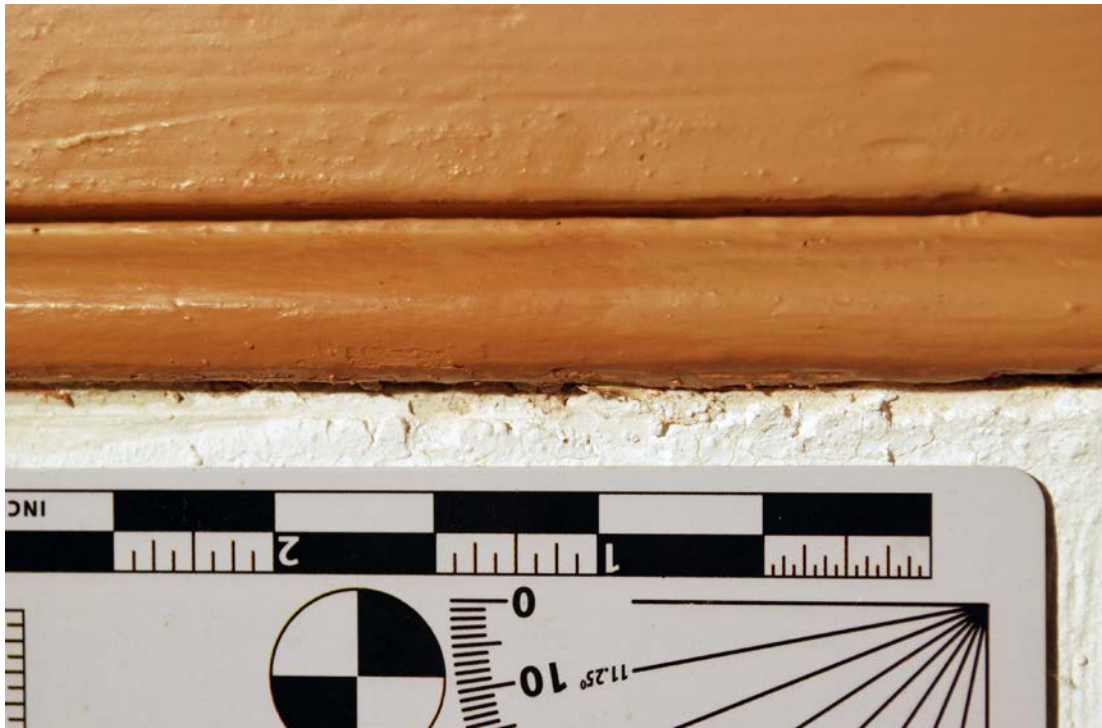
The Architectural Conservation Laboratory, “Detail of bead in frame under the sill of west window in meeting room” (July 12, 2012).
